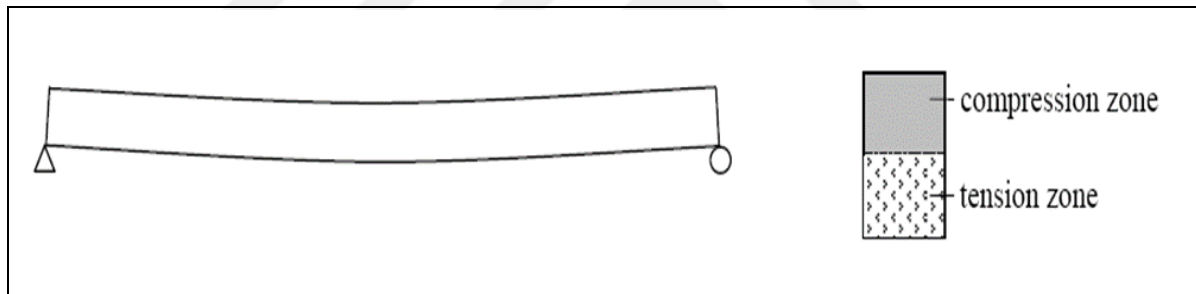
The Behavior of Beam Span Under Loading [9]
